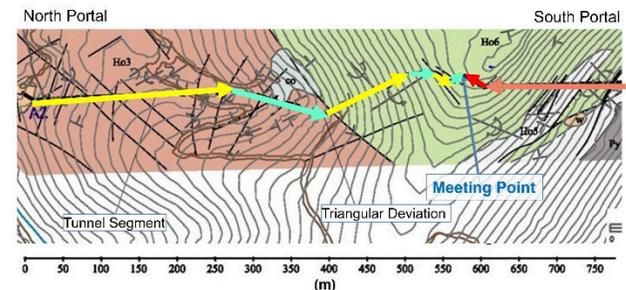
Plan view of tunnel alignment depicting the various courses of the tunnel.
